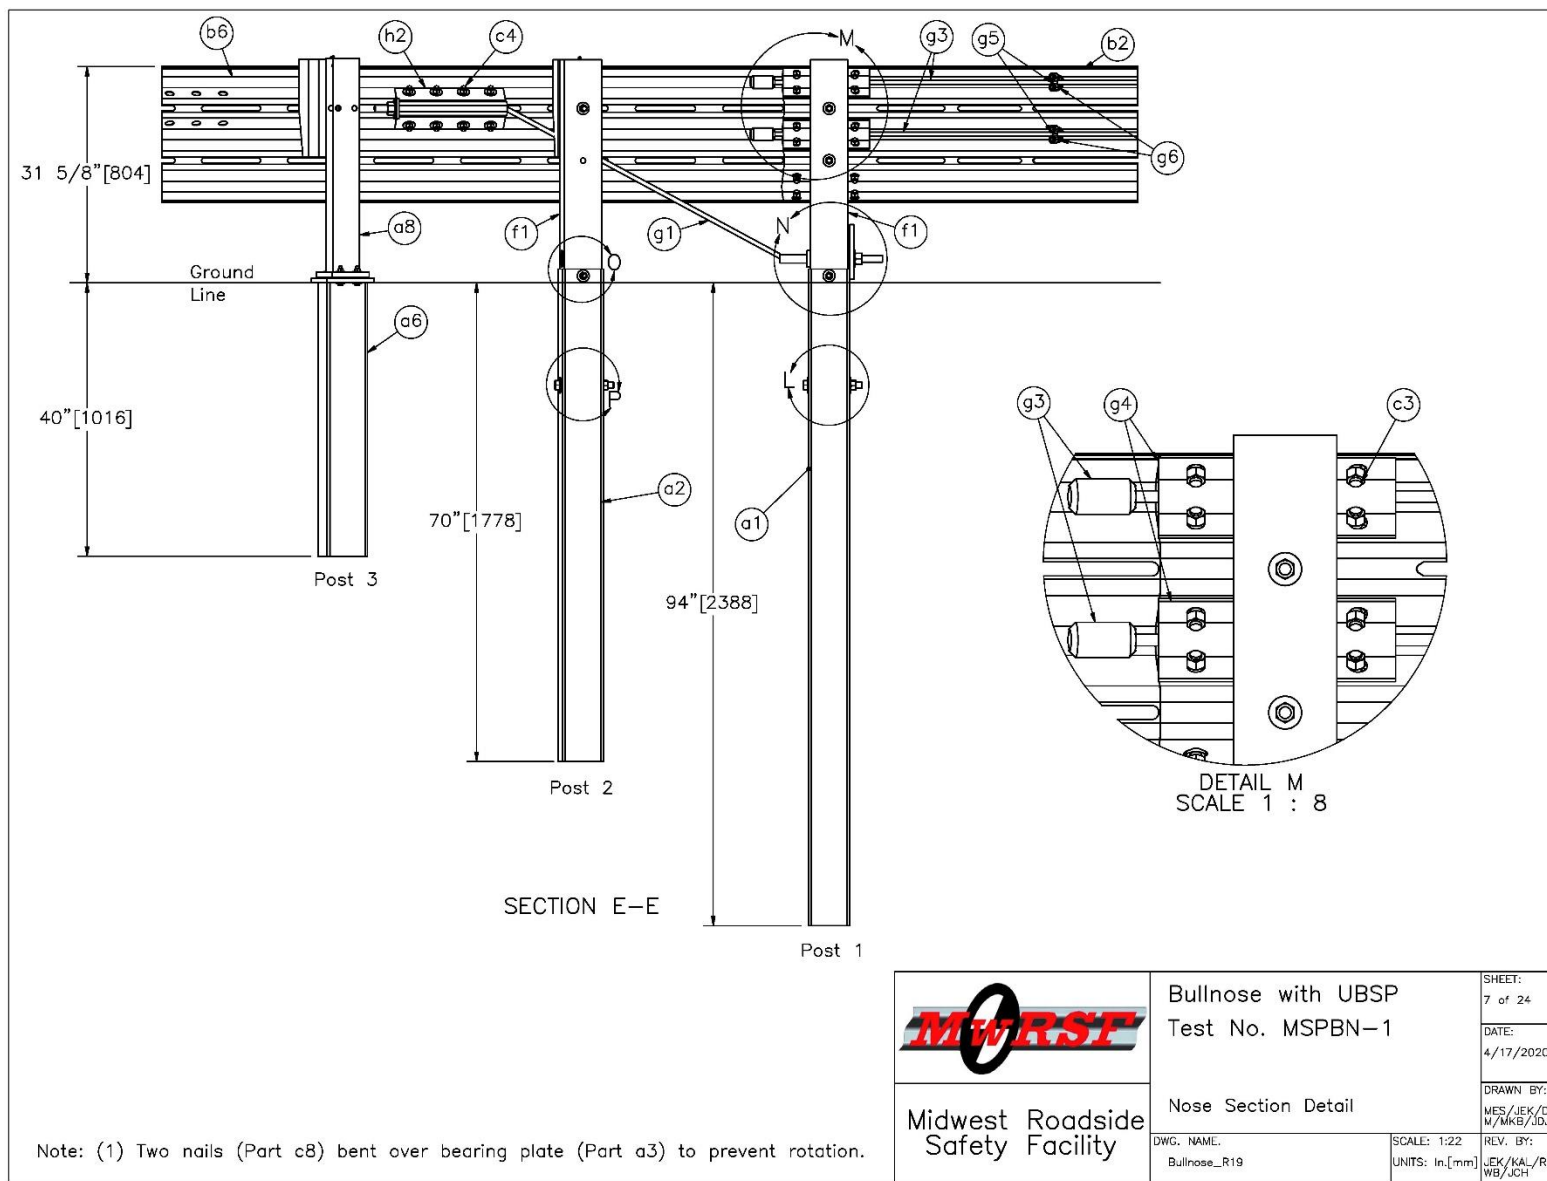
Nose Section Detail, Test Nos. MSPBN-1 through MSPBN-3
